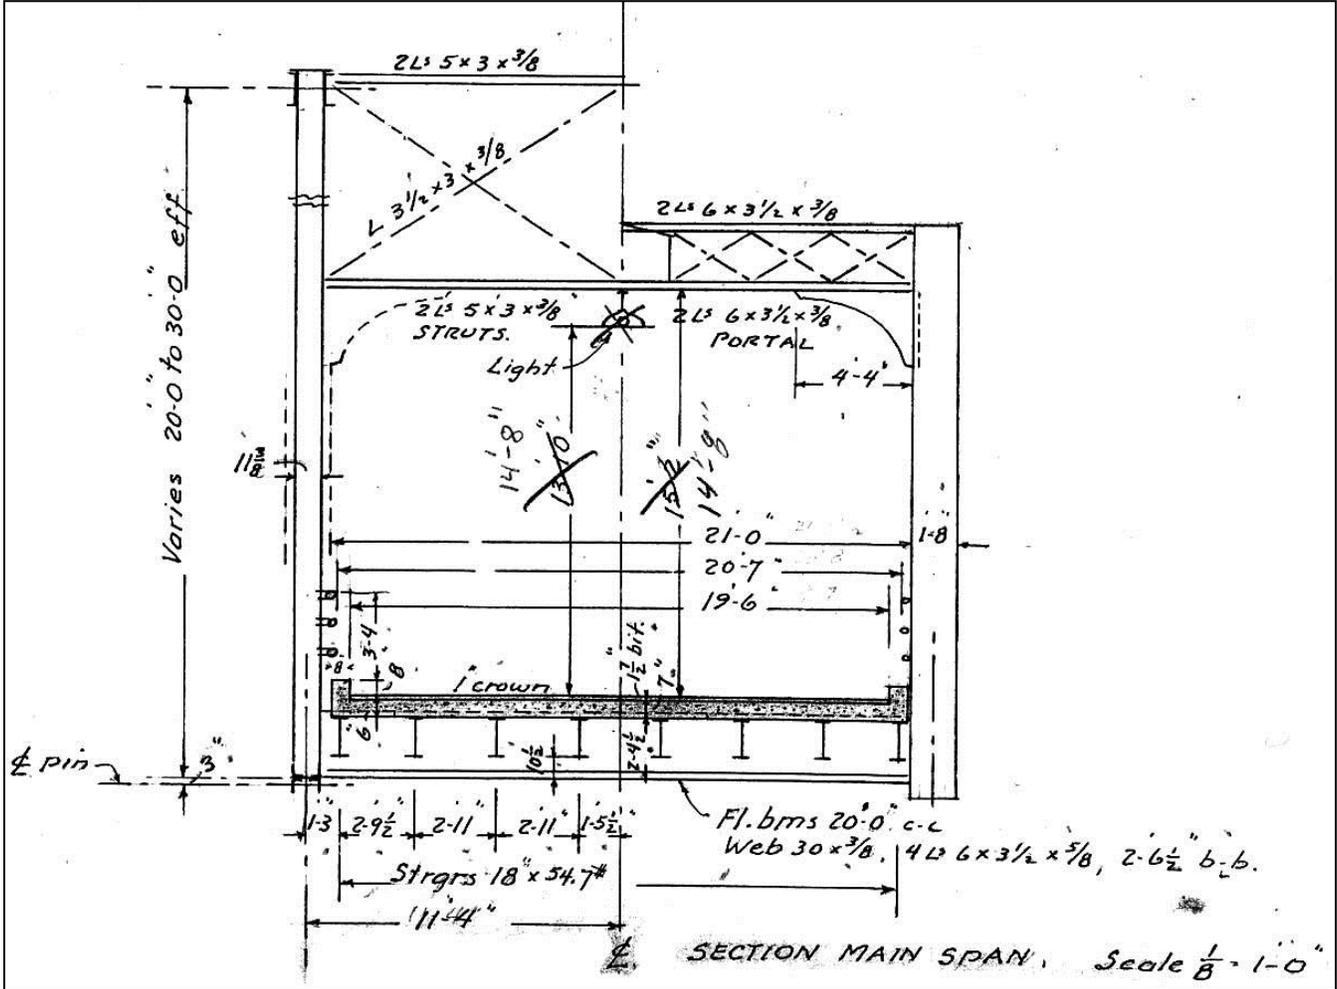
Hinsdale 042/044, "Hinsdale Bridge (1926)." NHHD sketch made from inspection June 11, 1941 showing section thru truss (NHHD Bridge Inventory Card).
